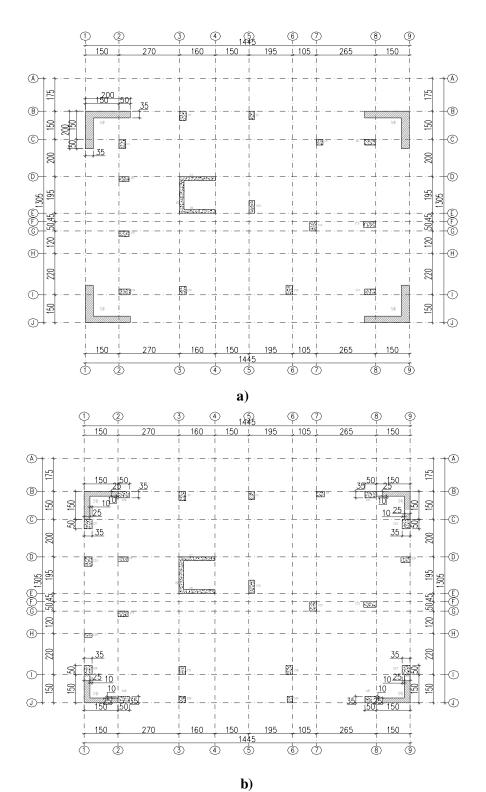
(a) Ground and b) first story floor plans of a building strengthened by shear walls of L cross section at the corners
